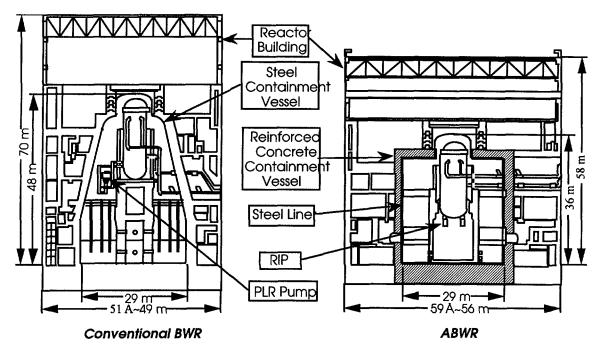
Reinforced Concrete Containment Vessel (RCCV) and Reactor Building.
